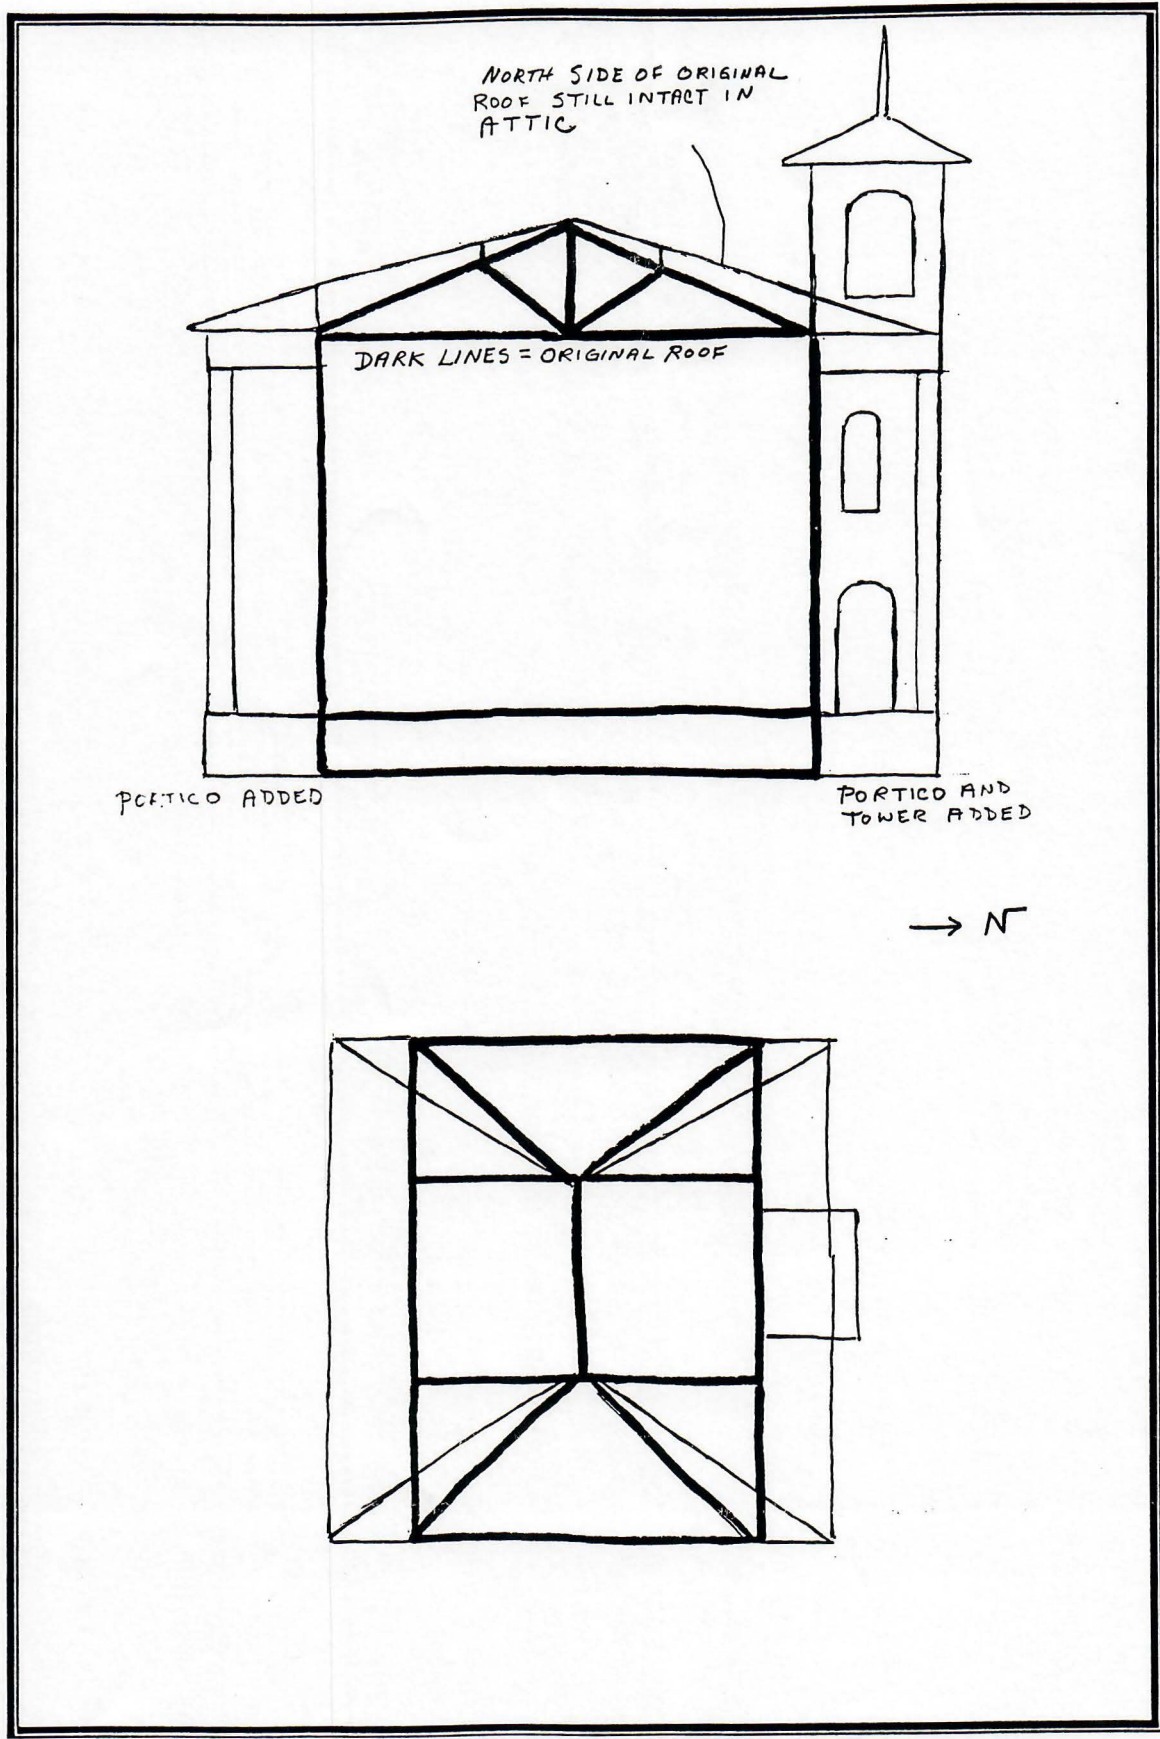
Drish House. Drawing showing original 1837 roof and later roof and tower. Robert O. Mellown. June 2000.
